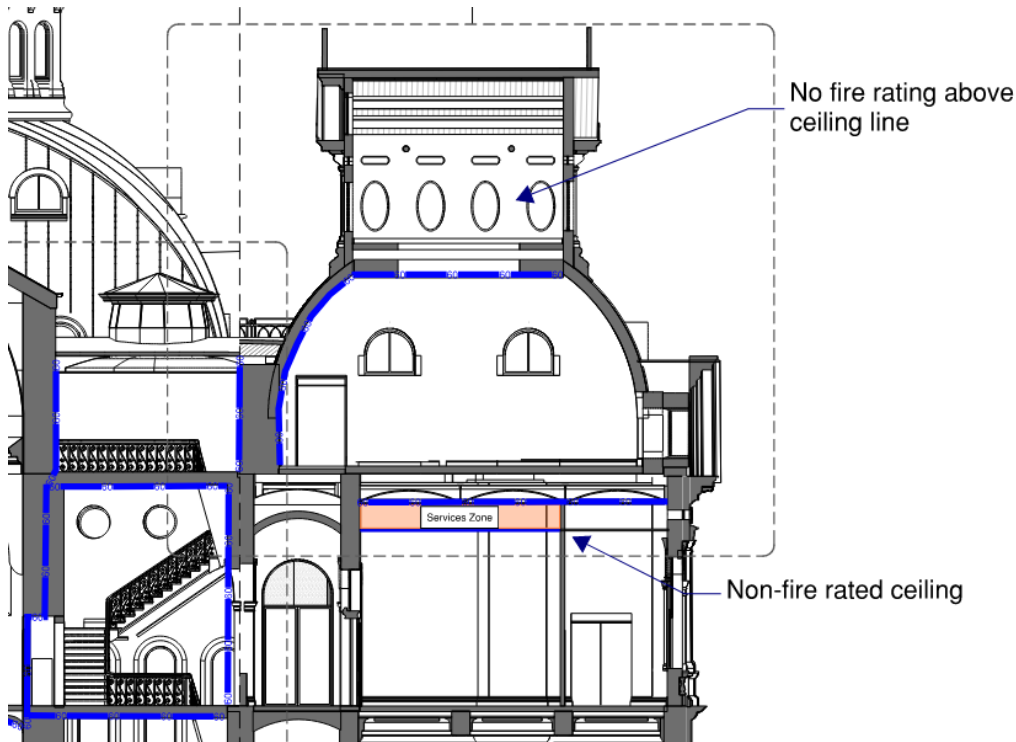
example of fire-rated bounding walls to fire-isolated stair extending pass roof line
